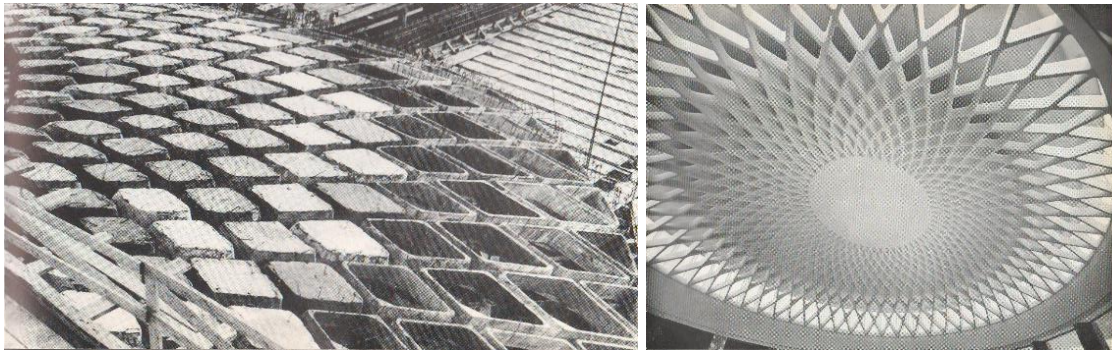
Precast elements prior to the placement of the in-situ concrete (a); Festival Hall dome (b) (Nervi, 1965)
